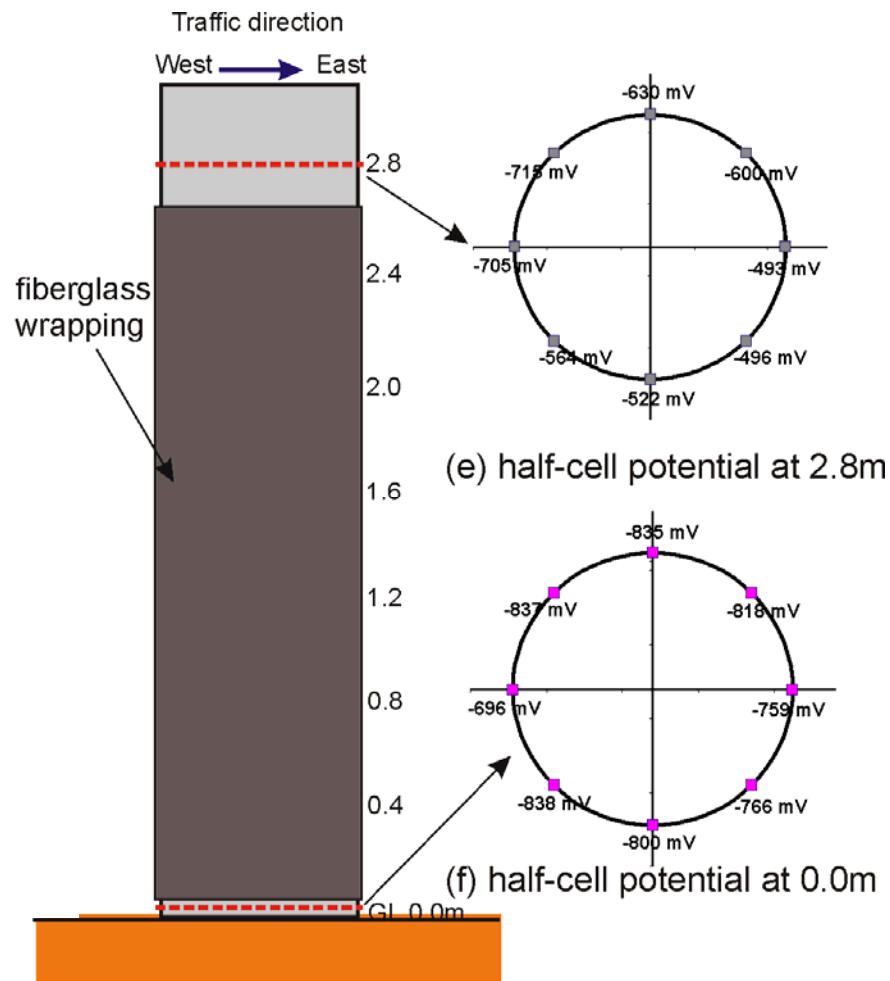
Half cell potential measurement in Bridge B-28-45 column B (fall 2007): (a) above wrap and (b) below wrap.
